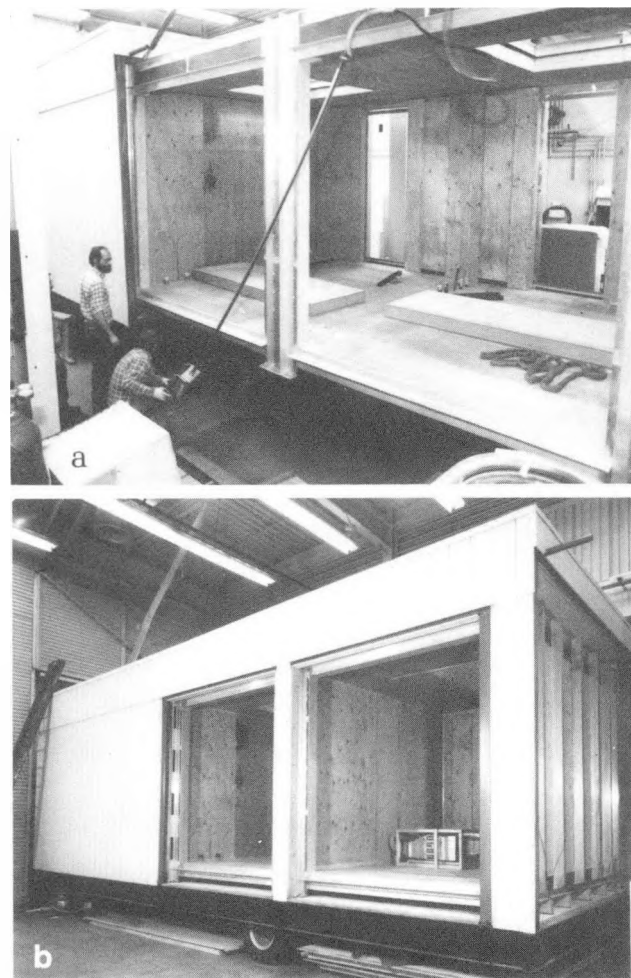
Progress of the MoWiTT facility. (a) Insertion of the calorimeter chambers. (b) The nearly-complete assembly. [(a) CBB 824-3063; (b) CBB 826-5379]
